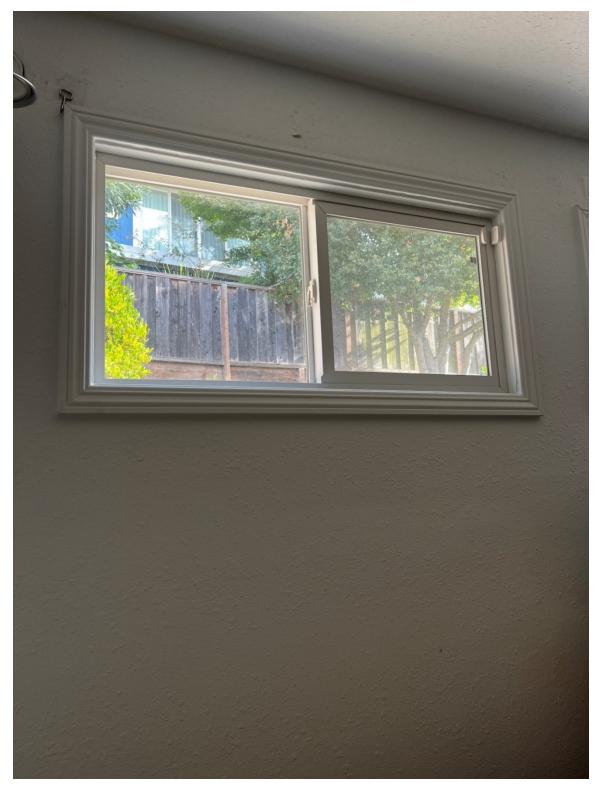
View from guest bedroom window up looking up towards the proposed Juliet balcony
